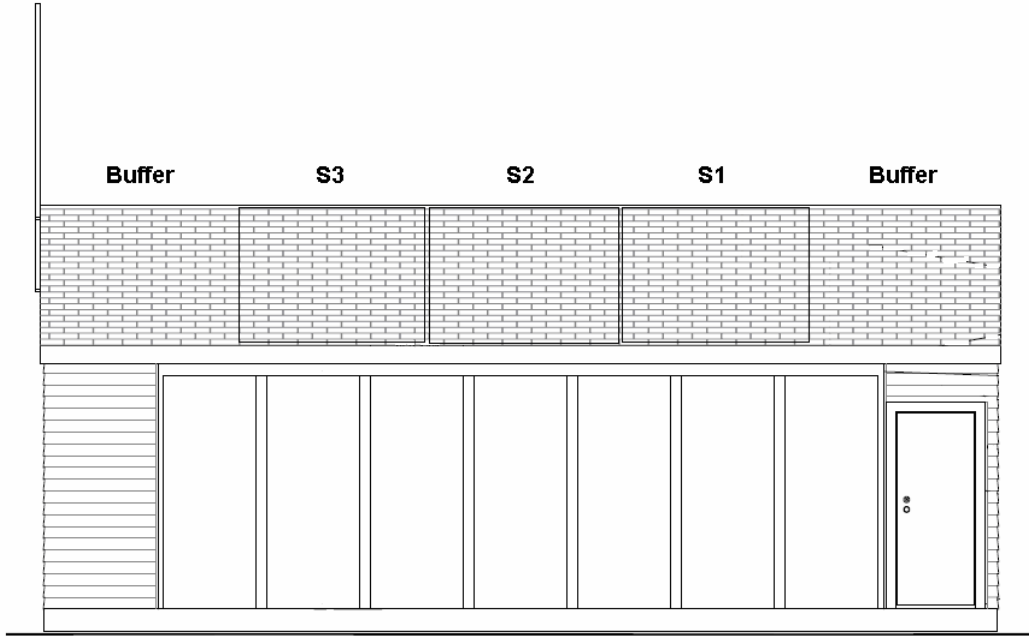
Coquitlam test hut: South elevation (North similar)
